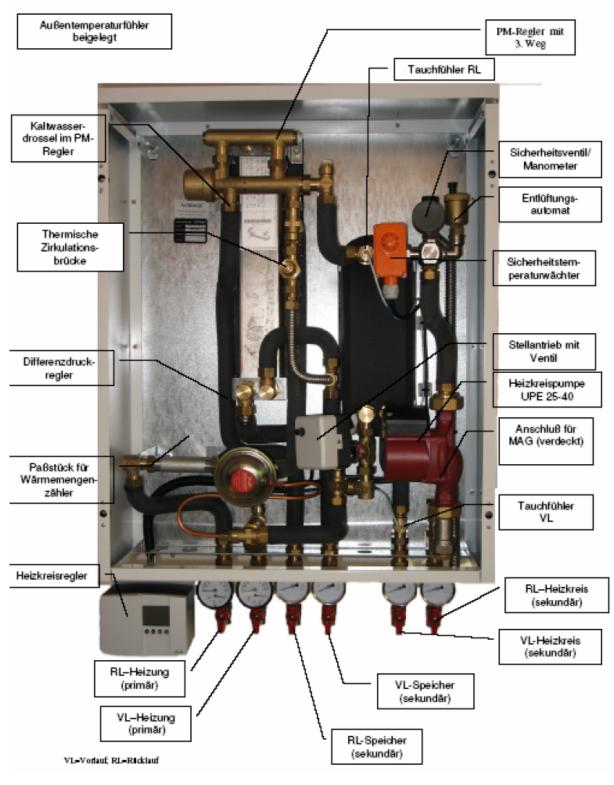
Heat transfer station within the house Source: Zauner Anlagenbau GmbH
